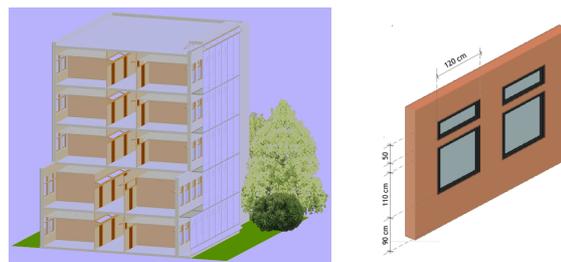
Perspective of the building and detail of lower and upper windows of northern and southern façade.
